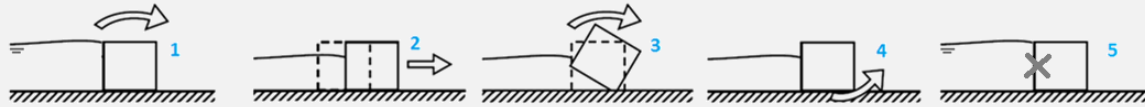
Typical structural failure mechanisms of temporary water retaining structures: Overflow (1), Sliding (2), Rotation (3), Seepage (4) and (5) Structural failure (Boon 2007)
